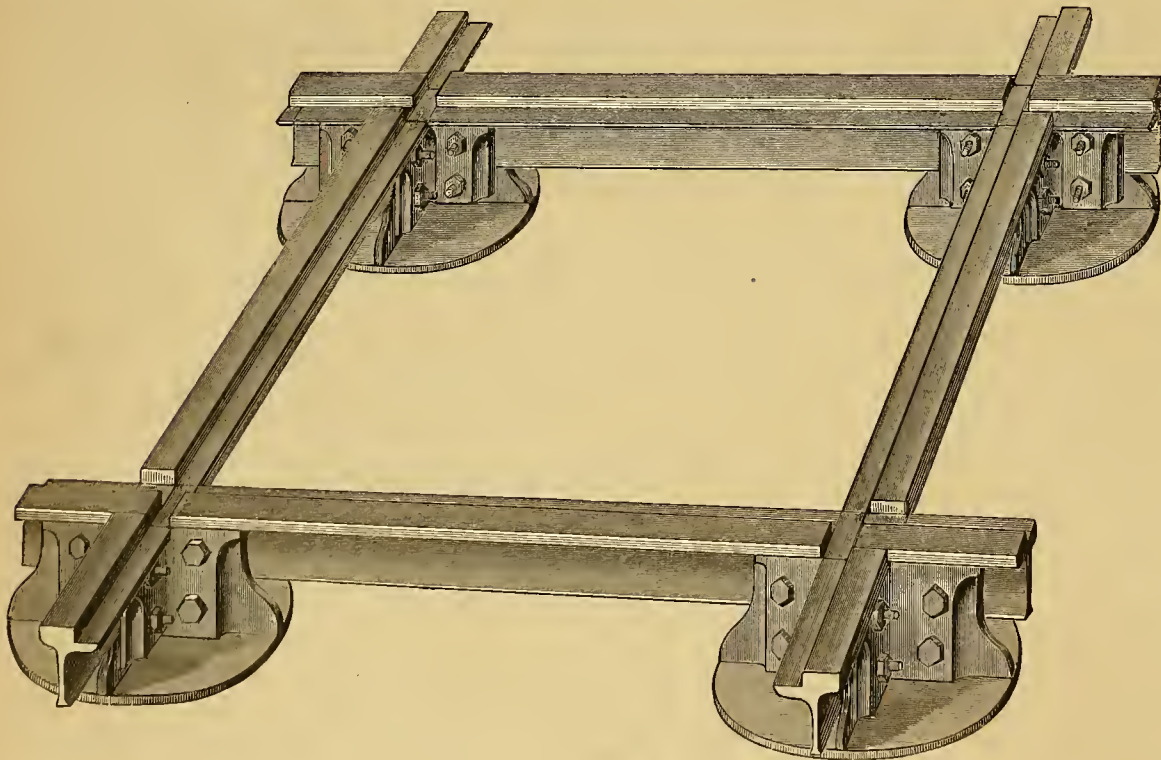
R. T. WHITE'S IMPROVED GIRDER RAIL CROSSING.
